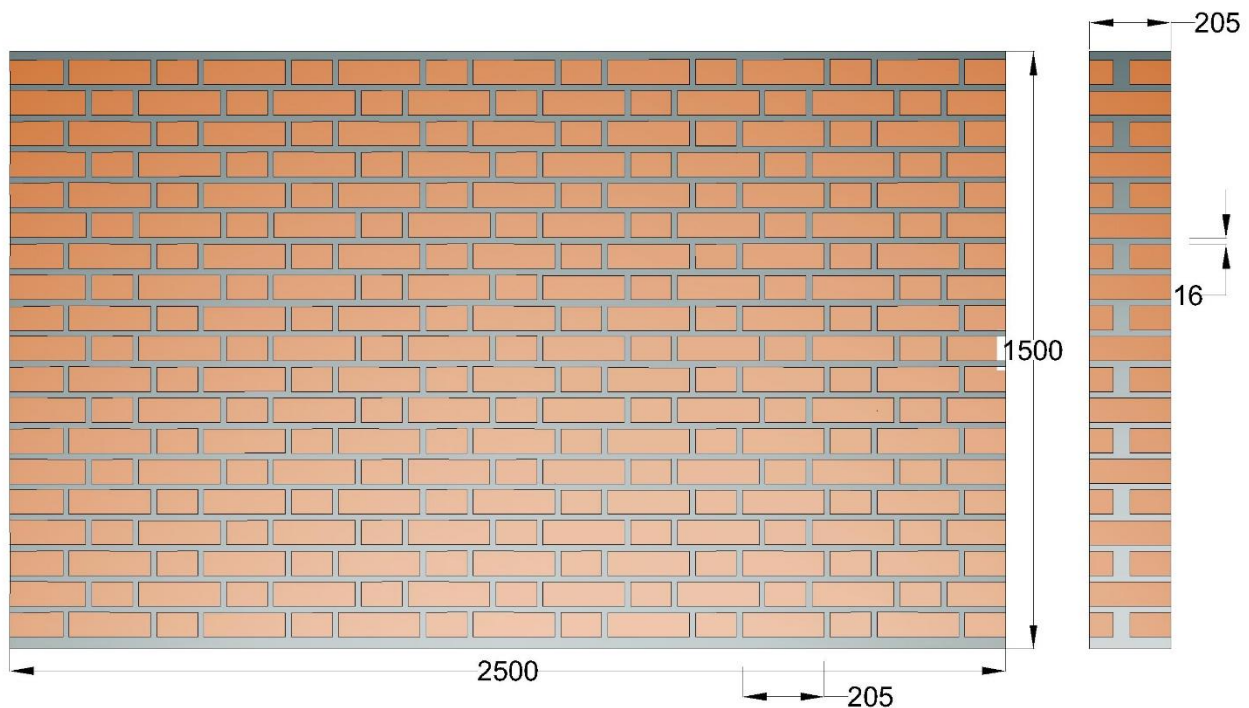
Wall geometry (values in mm) and Flemish bond pattern in brick masonry.
